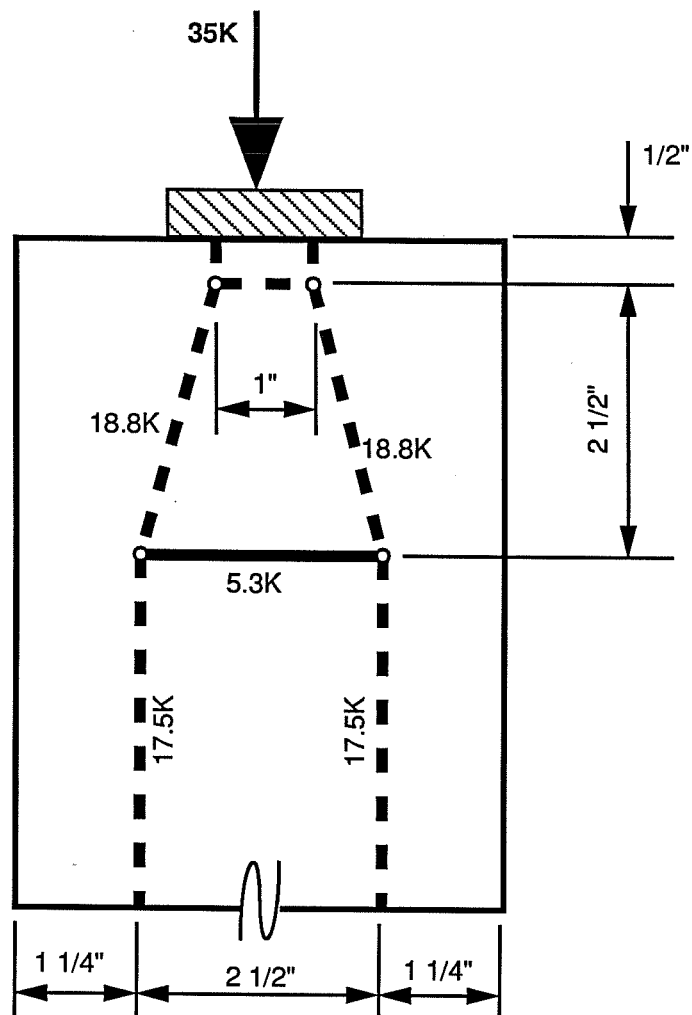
Transverse Slab Plane Strut & Tie Model
